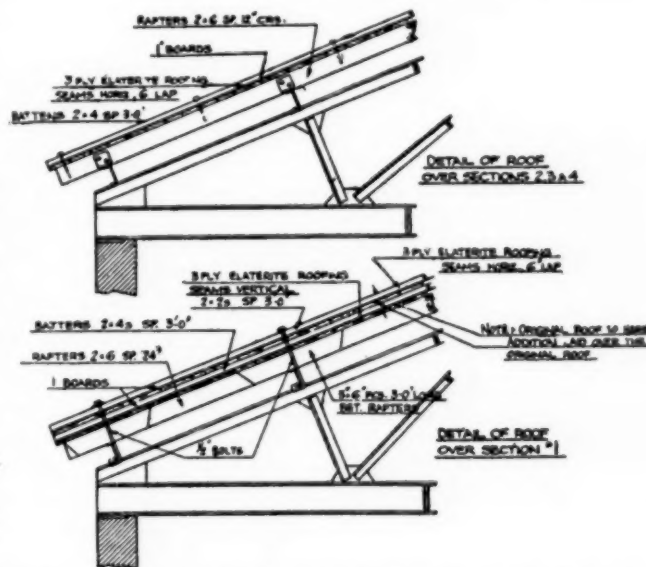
ROOF CONSTRUCTION OF BAGHOUSE, MURRAY, UTAH.
